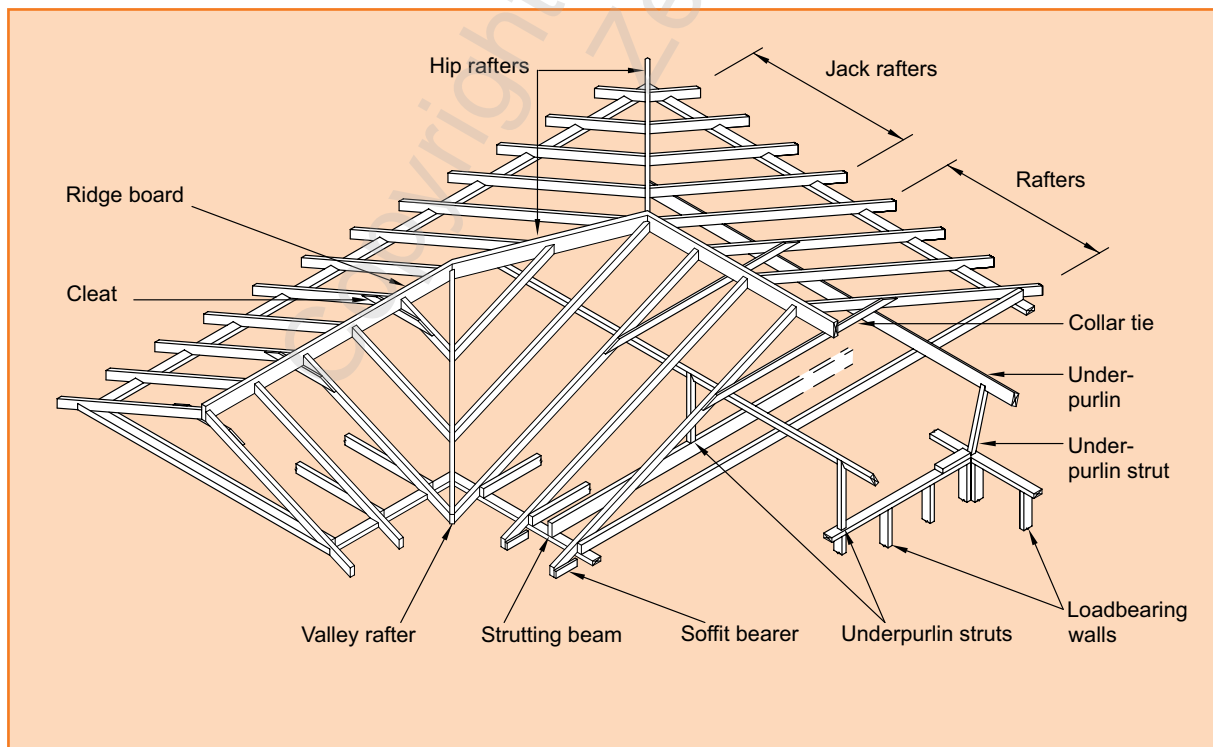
Roof framing members, couple-close roof (see 10.2.1.1)
